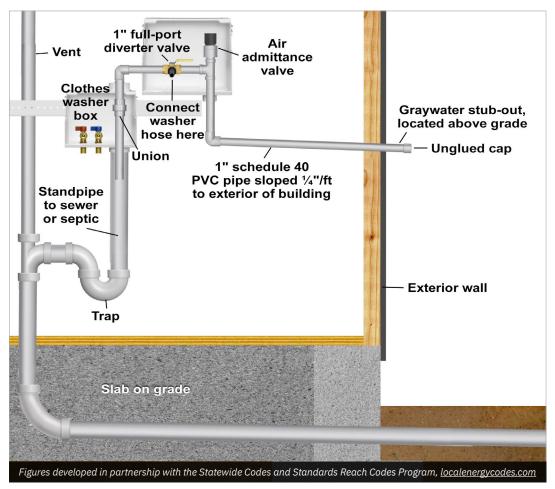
Dual drainage piping for clothes washer graywater system where clothes washer is near an exterior wall or on a concrete slab foundation
